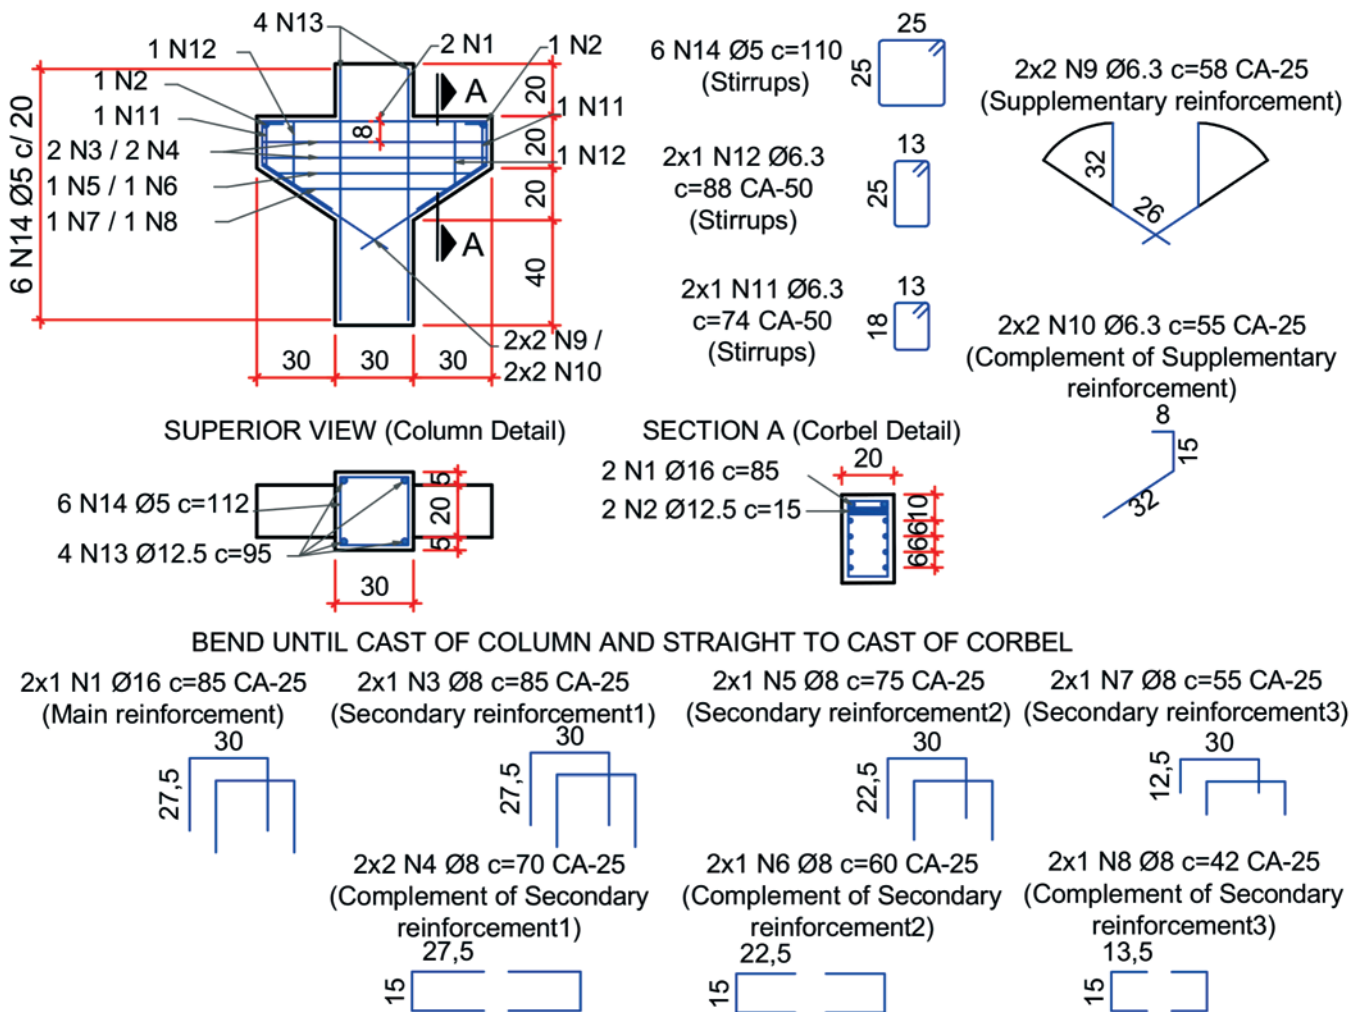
Reinforcement detail of models with corbels cast in different stage from the column (P4 and P5) with bent main reinforcement
